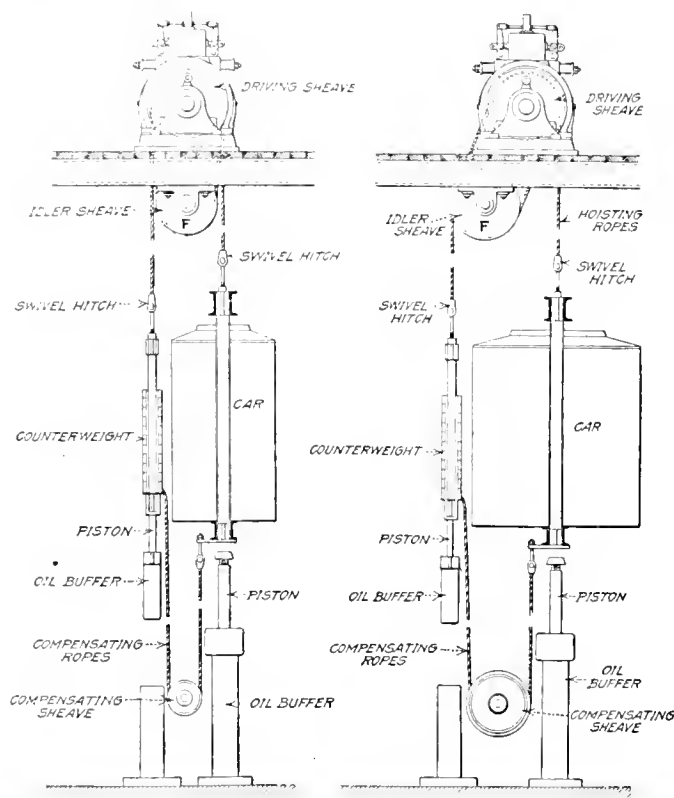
INSTALLATION WHERE DRIVING SHEAVE SPANS HALF THE CAR WIDTH
